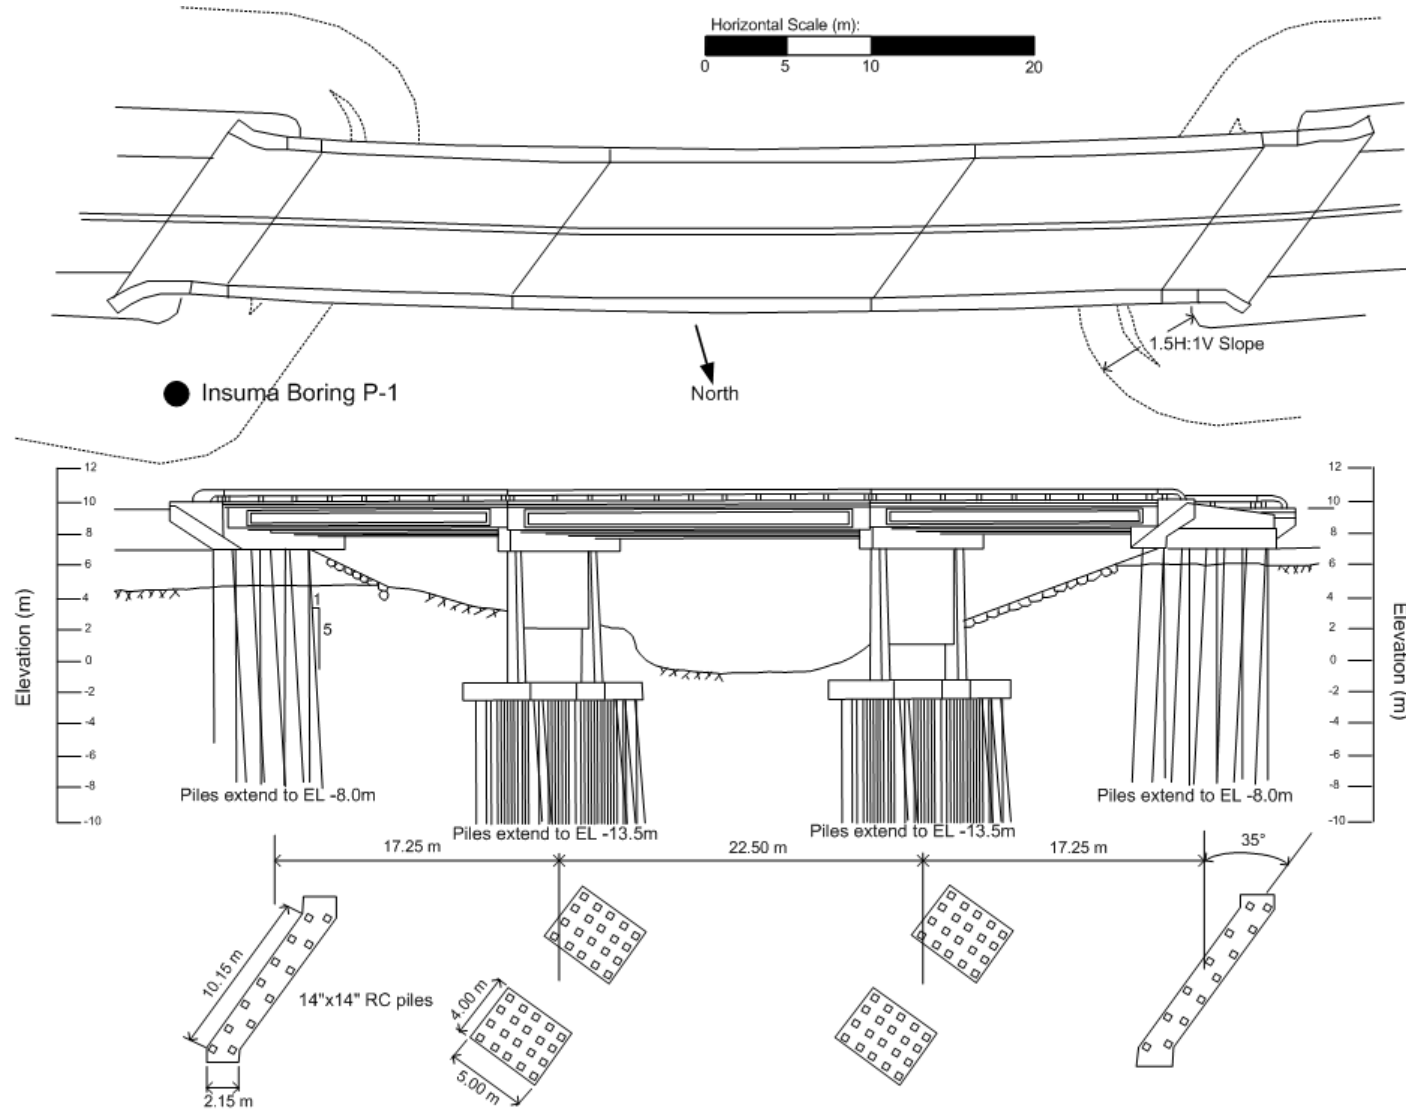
Simplified Sketch of the Plan and Profile Views of the Rio Blanco Bridge as Shown on the Bridge Plans
